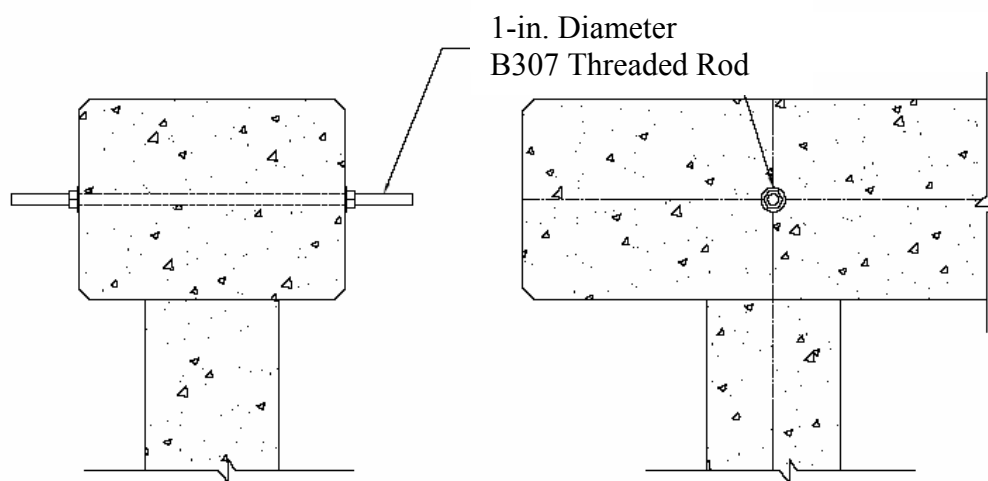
Schematic view of connection between hydraulic shaker and concrete beam
